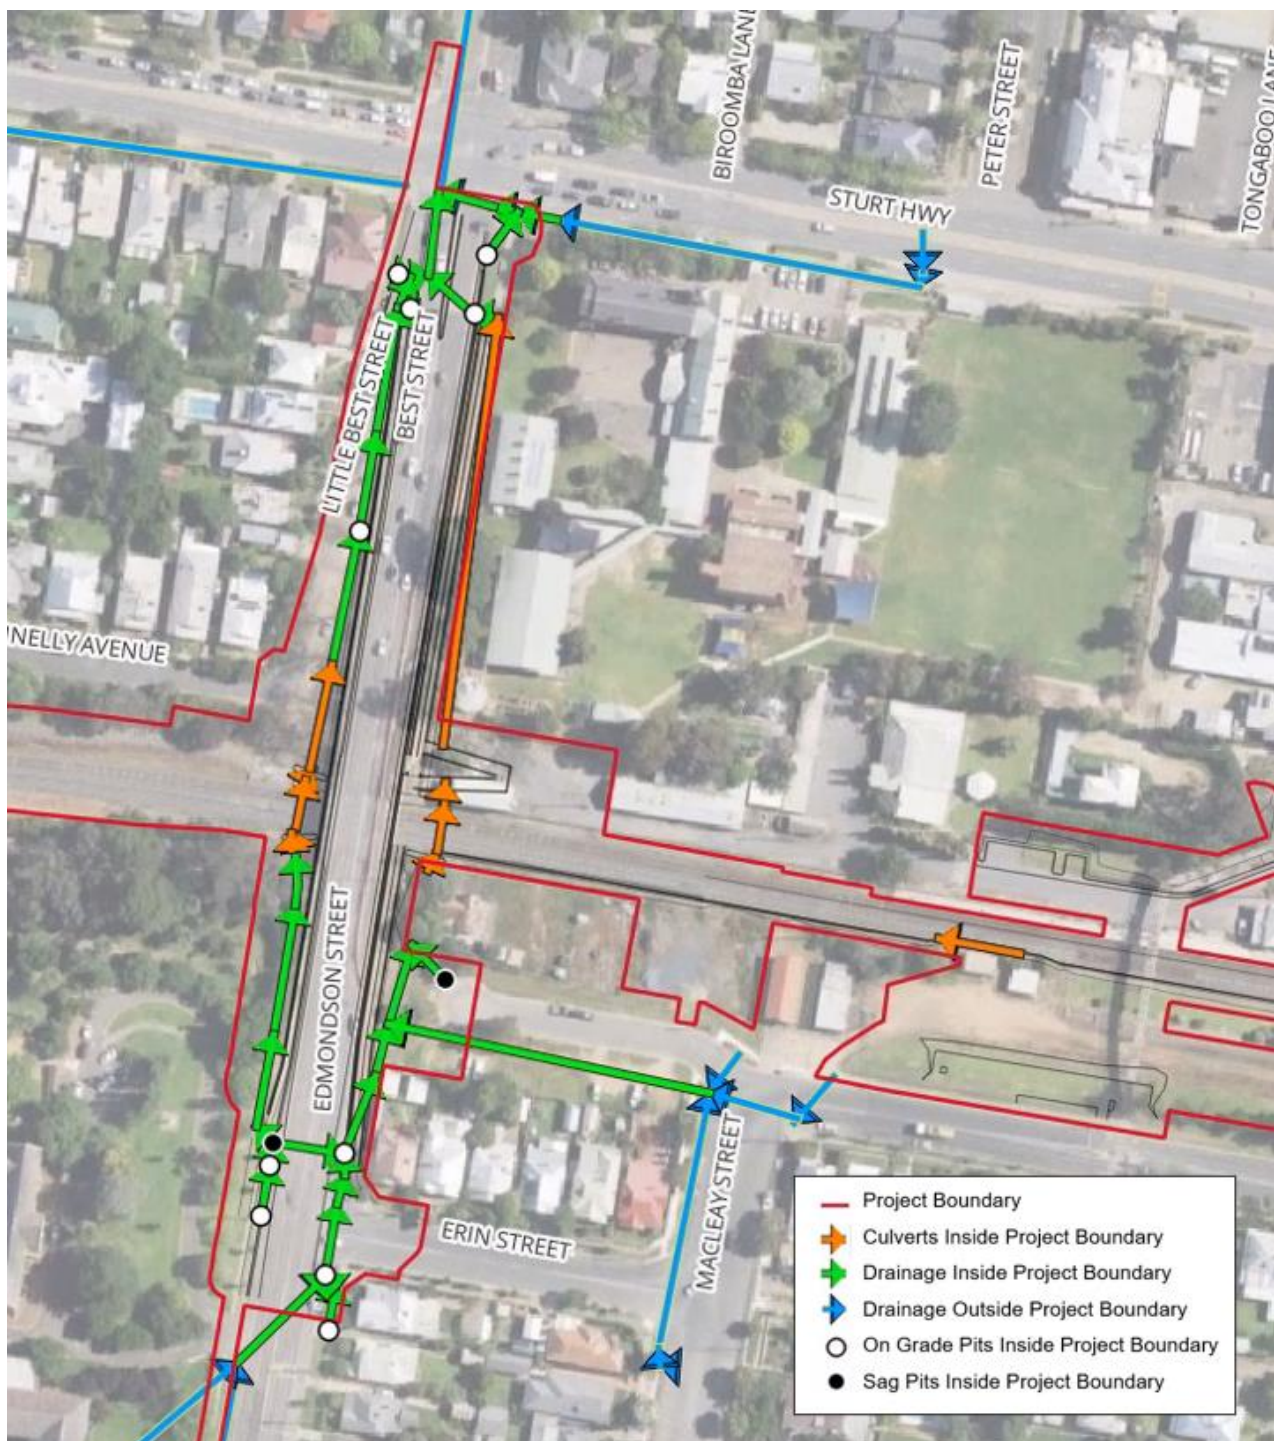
Culverts at Edmondson Street Bridge and Footbridge Site
